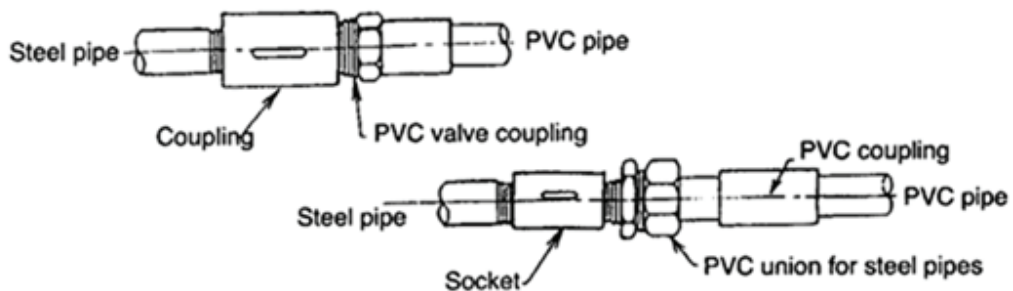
Connecting Steel pipe to PVC pipe using: (1) Steel coupling/PVC valve coupling; (2) Steel coupling/PVC union for steel pipes
